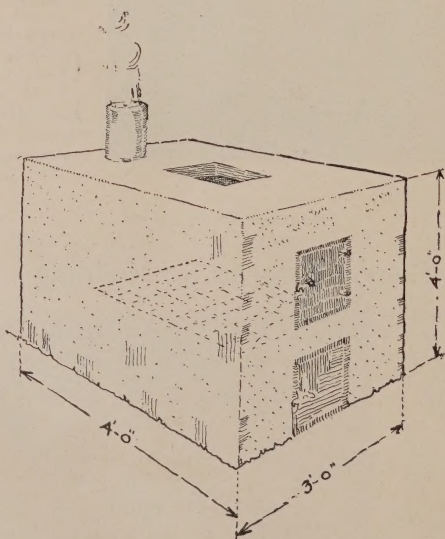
Drawing of trash burner showing dimensions. Opening in roof is in case the burner is to be used as a feed cooker. A cover should be provided for this opening to insure good draft when the burner is not used as a feed cooker.
